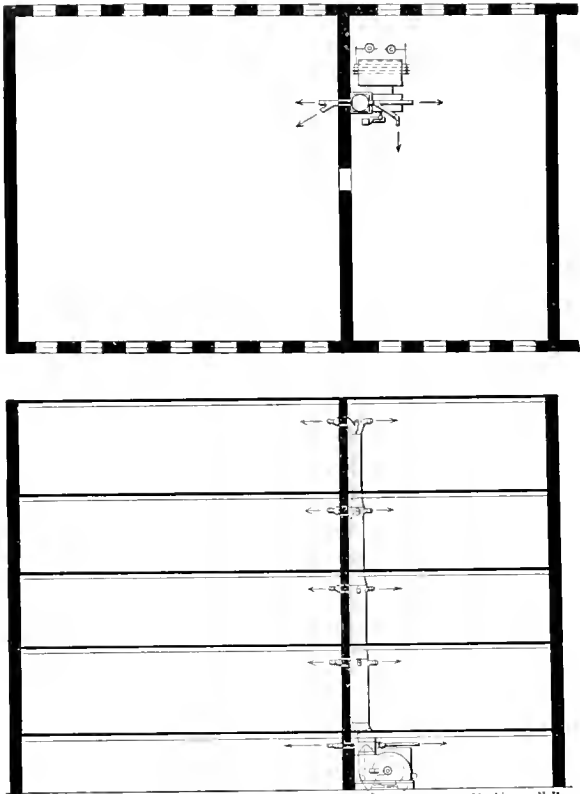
Simple Arrangement of Heating Installation of a Small Building.
